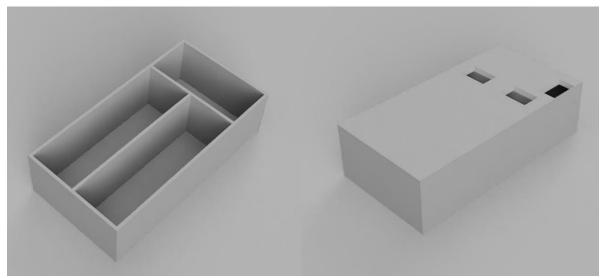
Storage tank with three compartments. The three manholes in the roof will be closed with a steel lid. Does not include openings for pipes. See Attachment A for CAD drawings of the formwork and rebar placement.
